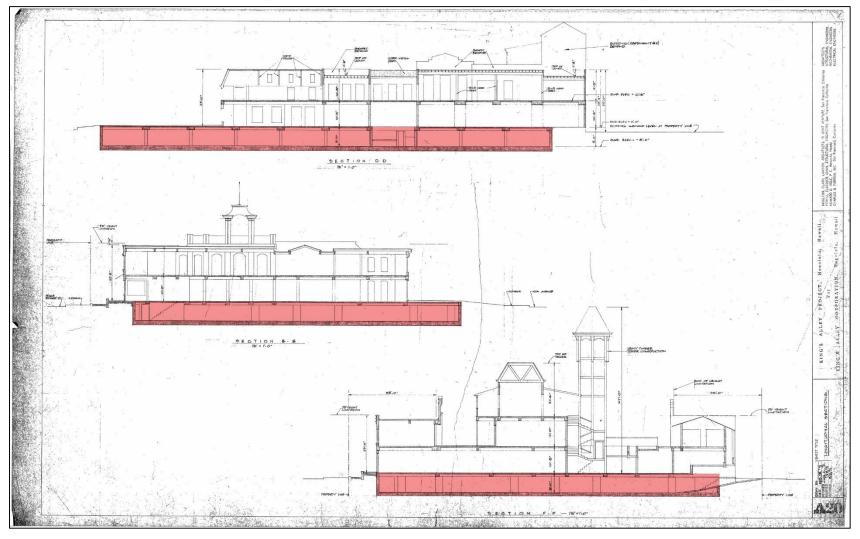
1971 drawing of the current King's Village structure and the underground parking garage (highlighted in red). The plan notes the garage extends eight feet below the ground surface (provided by client, originally designed by Moulton, Clark, Lawton Architects for the King's Alley Corporation)
